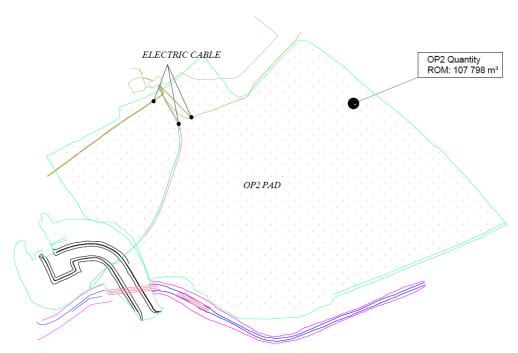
OP2 Stage 2 Preliminary As-Built
